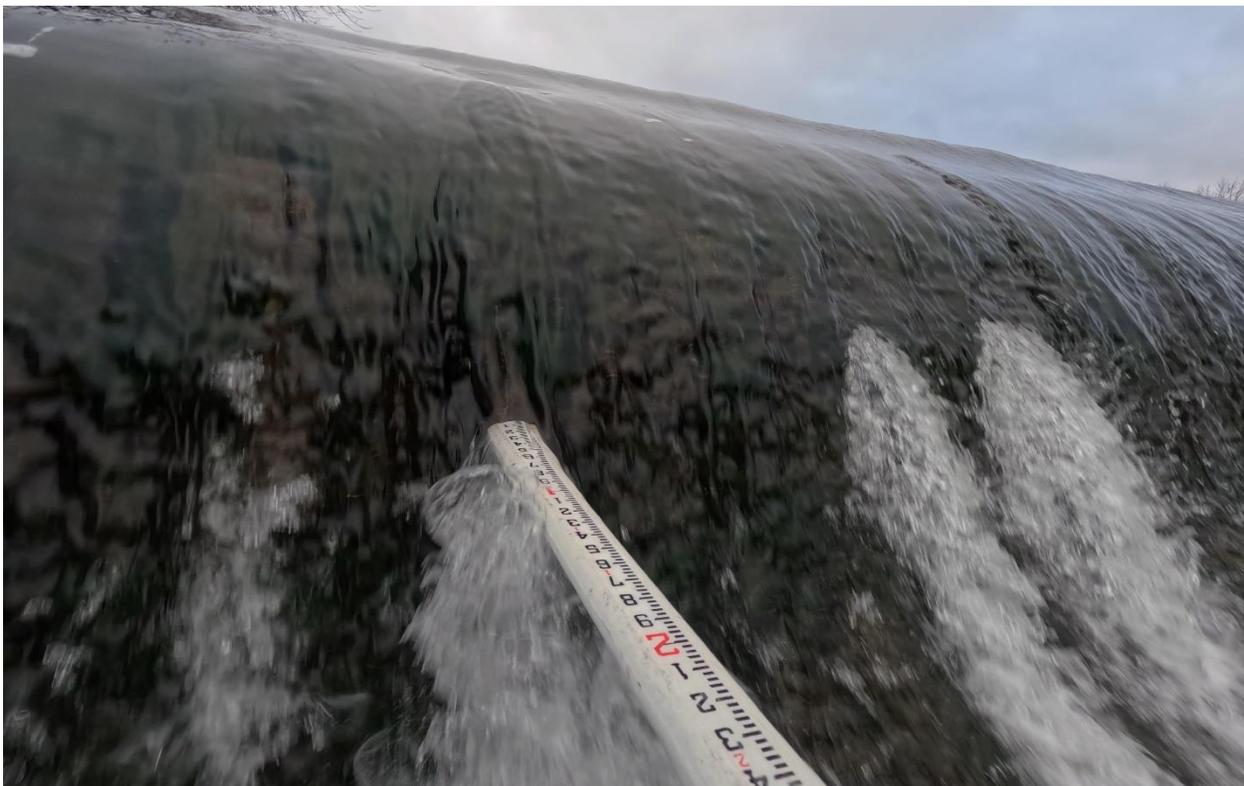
SPILLWAY TYPICAL CONDITION LOOKING WEST
